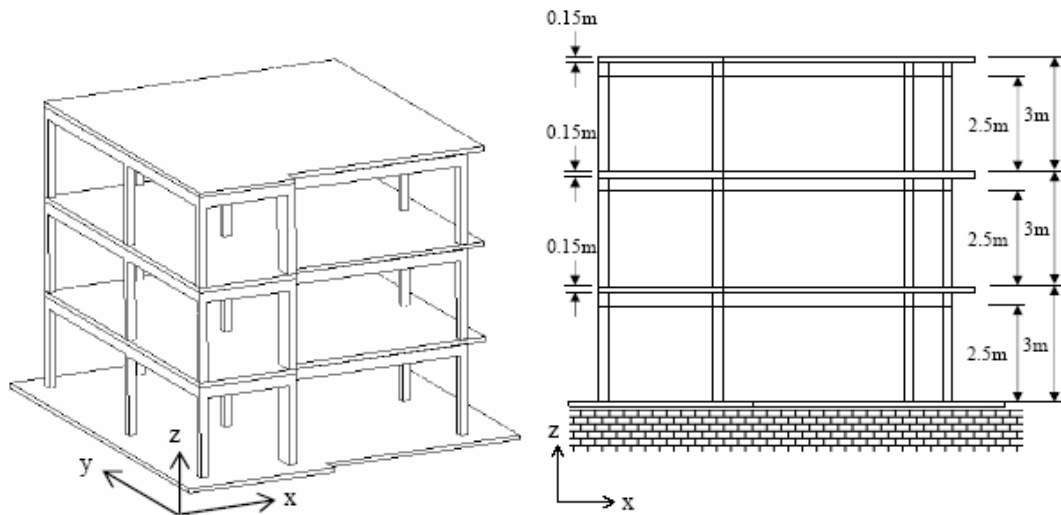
3D and elevation view of the SPEAR test building (Adapted from Jeong and Elnashai, 2004)
